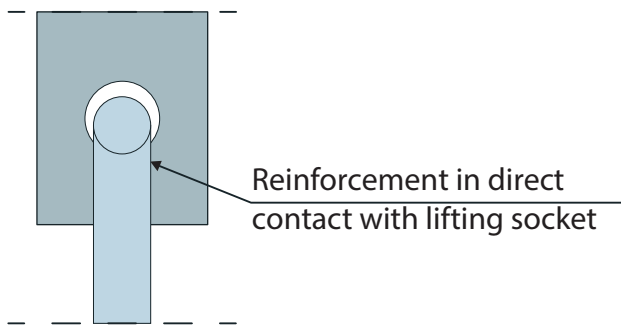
Placing of RLS lifting socket anchoring reinforcement in hole
